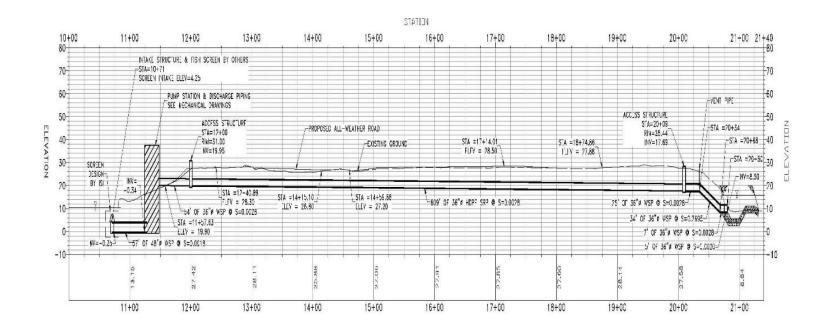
, as discussed below, provides all the relevant information on the hydraulic profile of the pump station and river stages that were considered in the design. This figure provides the invert elevation of the wet well, - 0.34 feet which would dictate the extent of excavation in the river channel during construction and the technique used for construction as outlined in the Construction Activities and Schedule below. This elevation in turn is determined by the need to keep the fish screen fully submerged during low flow summer flow conditions when the diversion pumping would be occurring. For design it is assumed that during the normal irrigation season the water surface elevation in the river would be well above the fish screen as shown in Figure 5.
